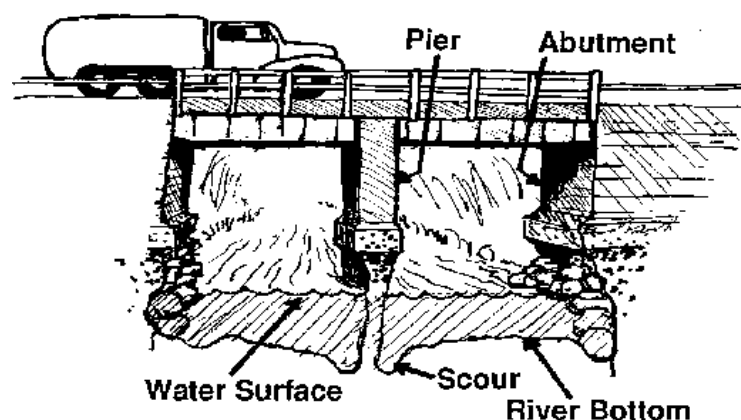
Bridge scour at pier and abutment (Warren, 2016).
